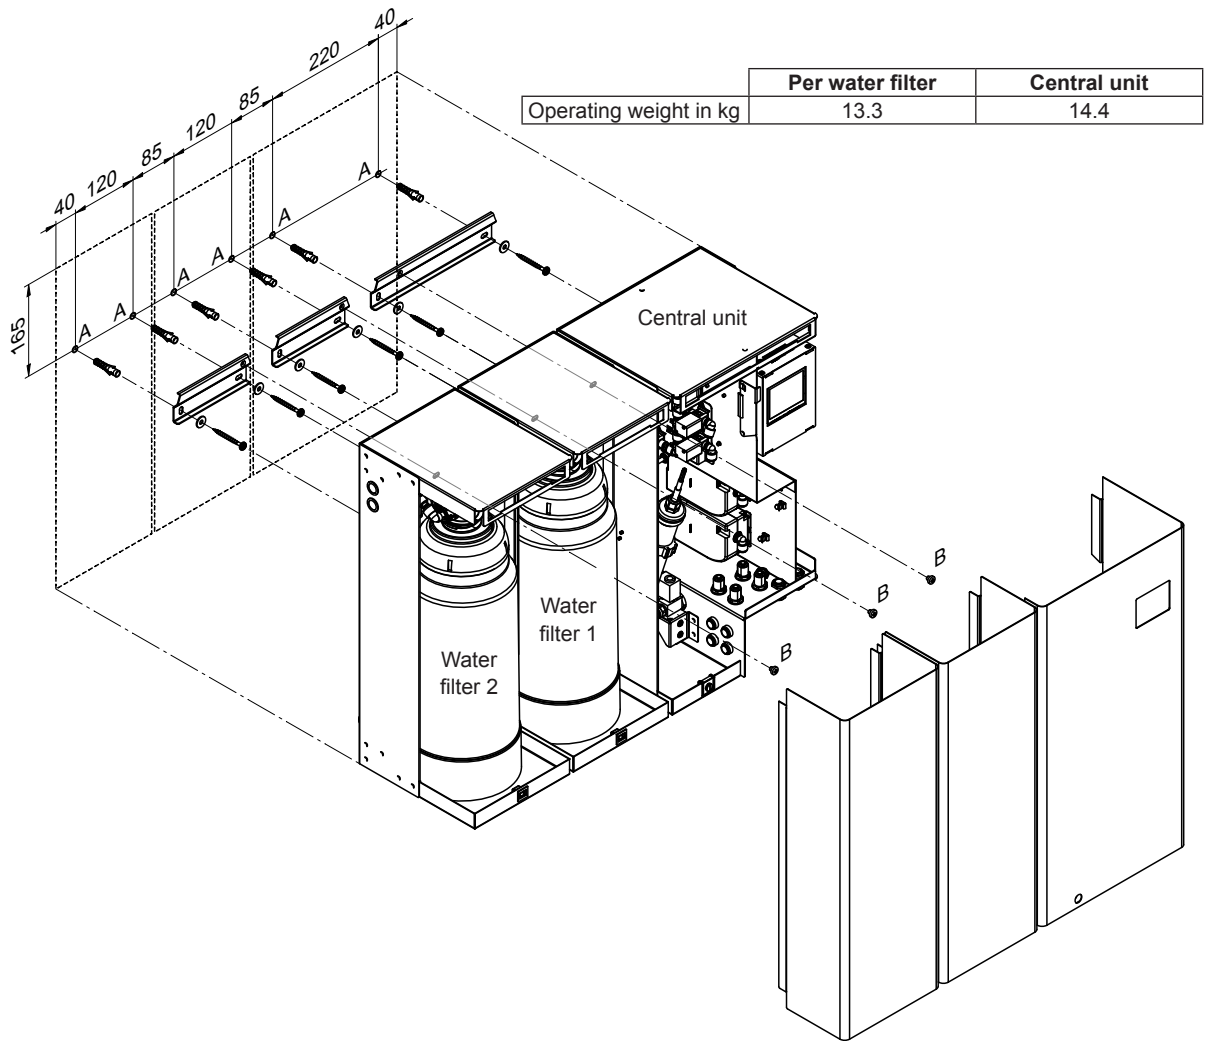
Central unit installation overview (dimensions in mm, illustration shows installation with screws and dowels)
